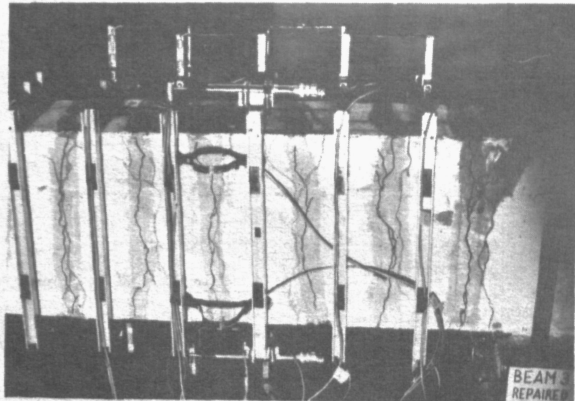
CRACK PATTERN, BEAM 3 AND 3R
